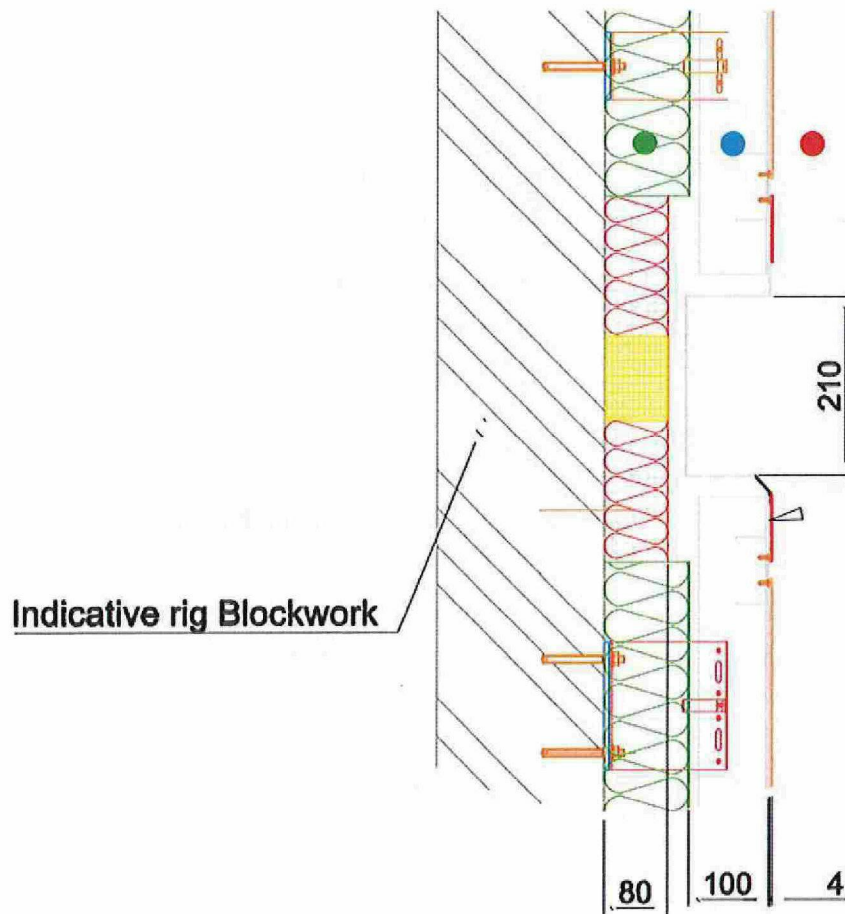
Level 2 Section Drawing Showing the Thermocouple Locations
